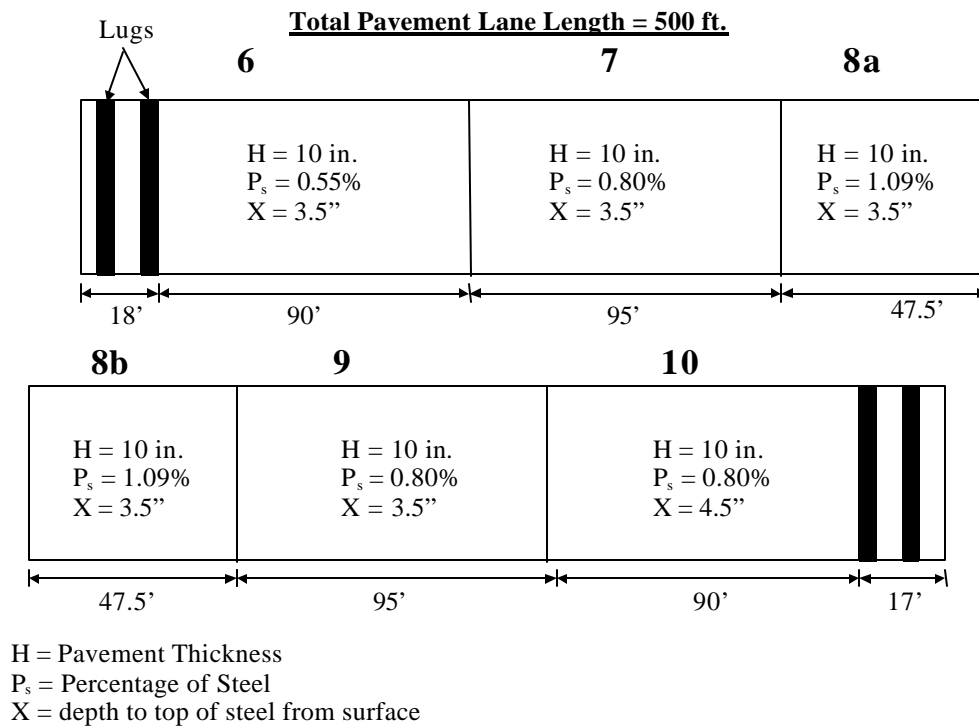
CRC Pavement Lane 2 with induced crack spacing of 2 to 6 feet.
